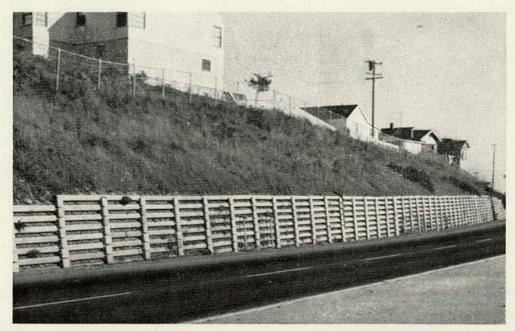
Restraining structure; concrete crib wall installed during construction to prevent land movement which might jeopardize dwellings located above top of cut slope at Arcata, Calif. Note gravel backfill. (Photograph by T. W. Smith, courtesy of California Division of Highways)
